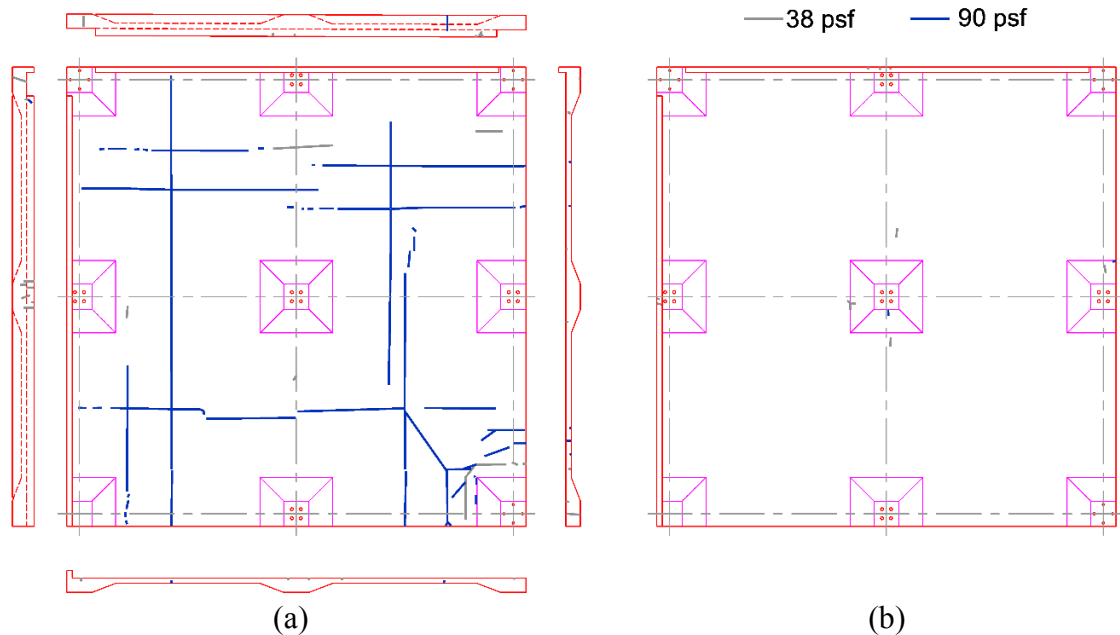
Schematic of cracking on specimen 1 after uniform gravity load application, (a) bottom and sides of the specimen, (b) top of the specimen. Black - cracks after 38 psf and blue- cracks after 90 psf.
